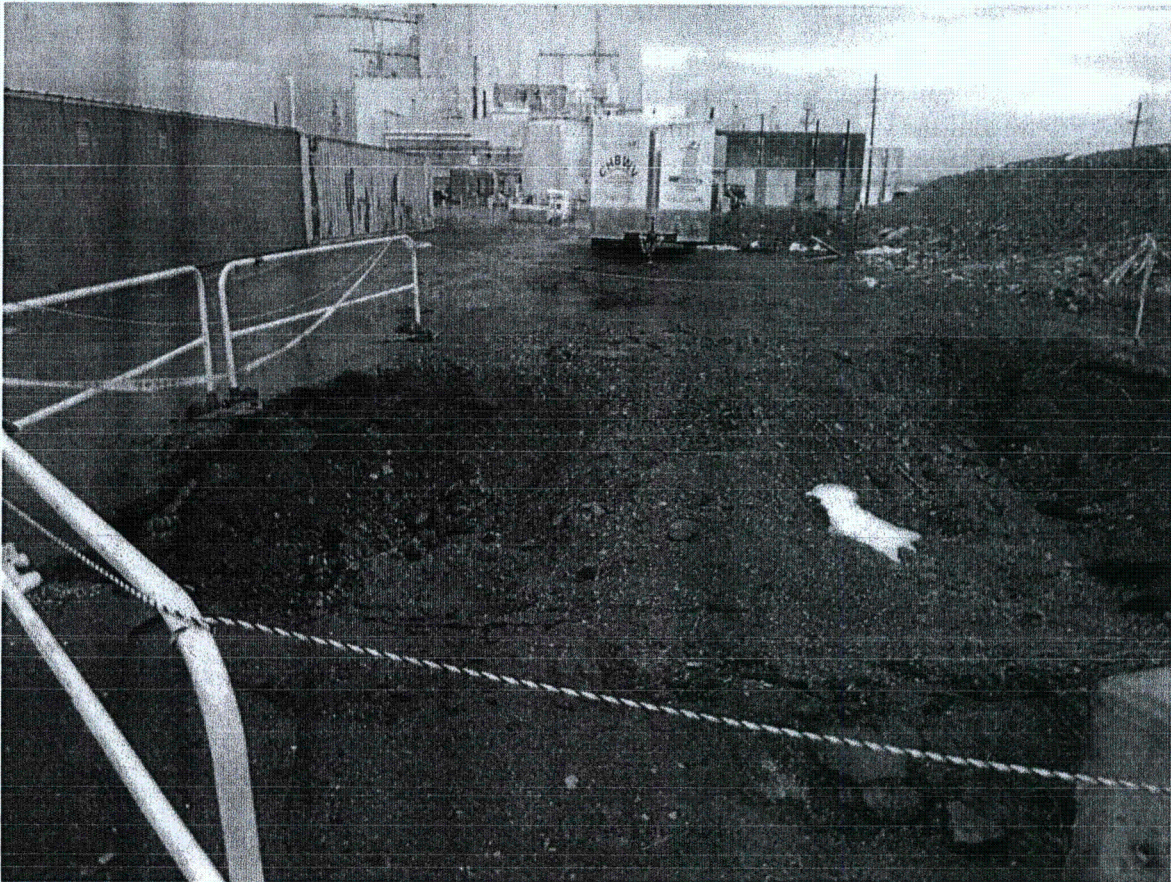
Biovent System Shack Excavation When Surveyed
